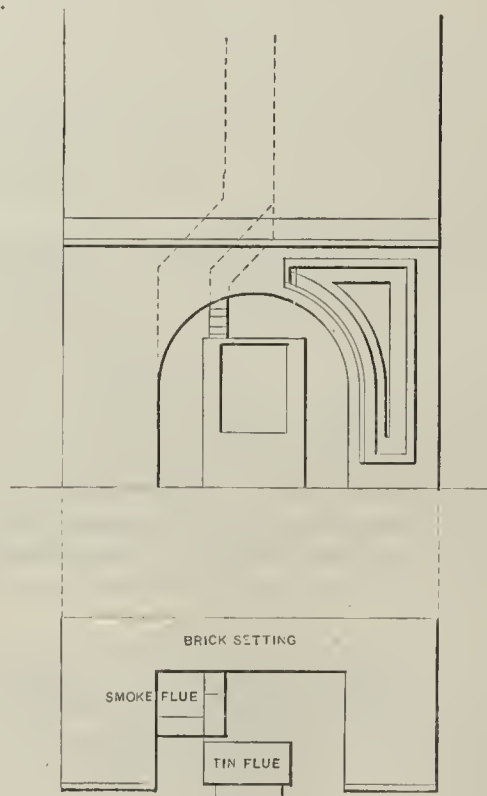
Plan and Elevation, Showing Smoke and Air Flue Substituted for Fire Place Heater.
